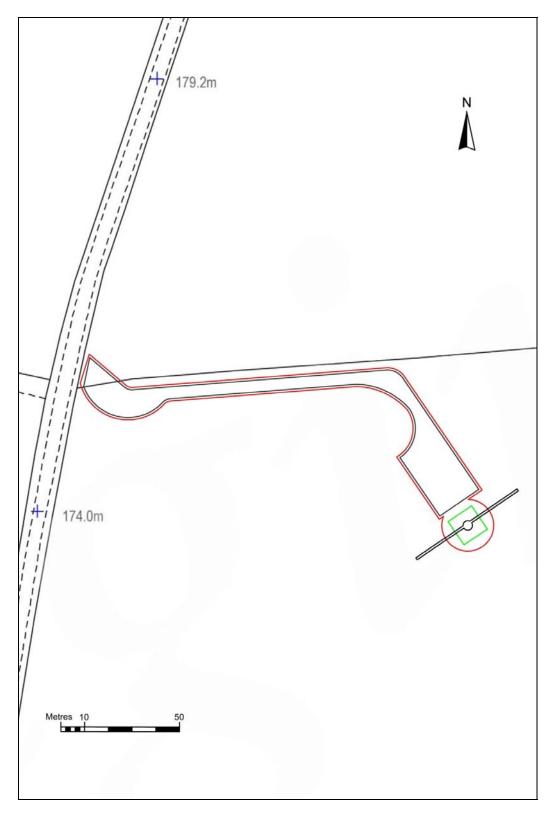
DETAILED PLAN OF WATCHING BRIEF AREA
